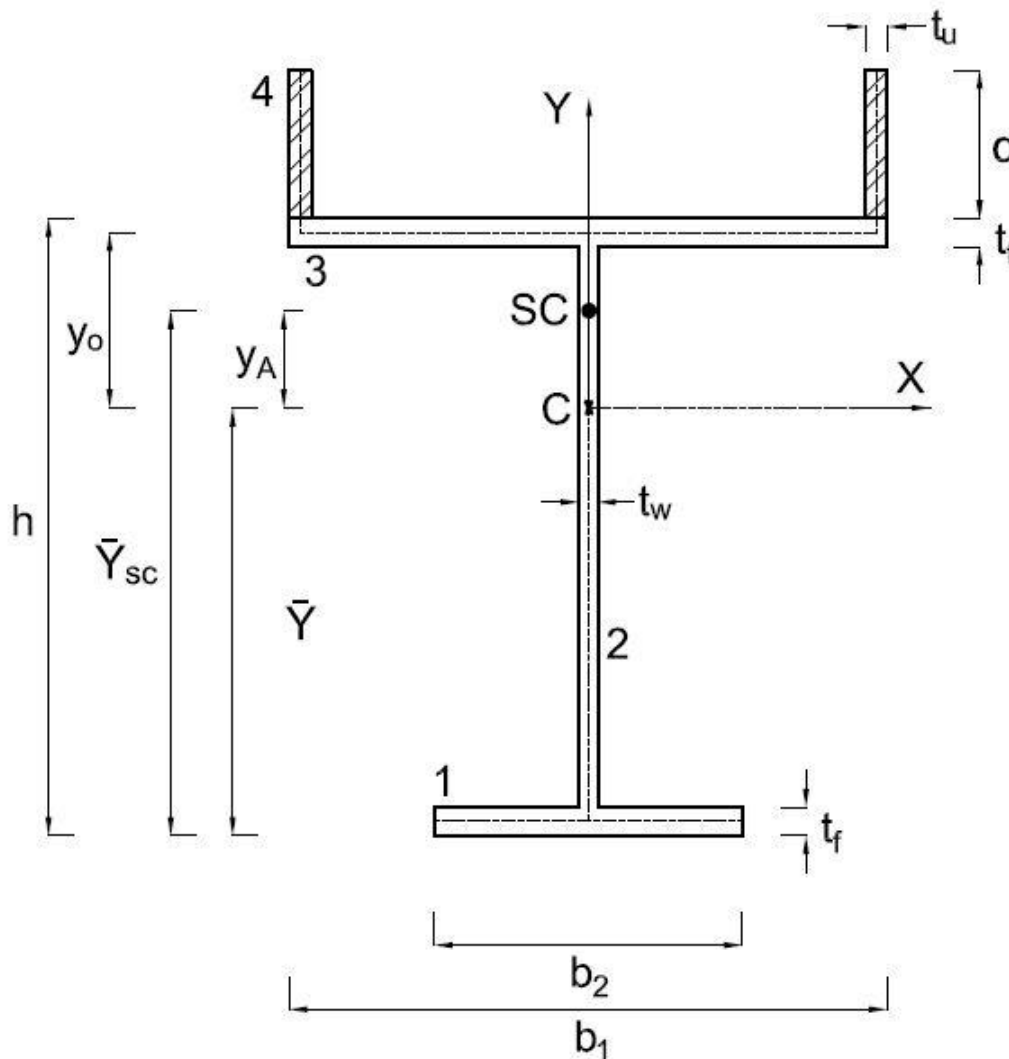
Mono-symmetric I or H section of trimmed bottom flange dimensions
